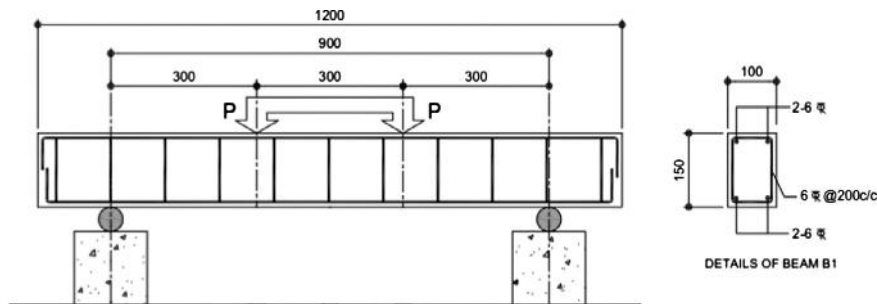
Typical reinforced concrete beam (B1) details and loading arrangement.
